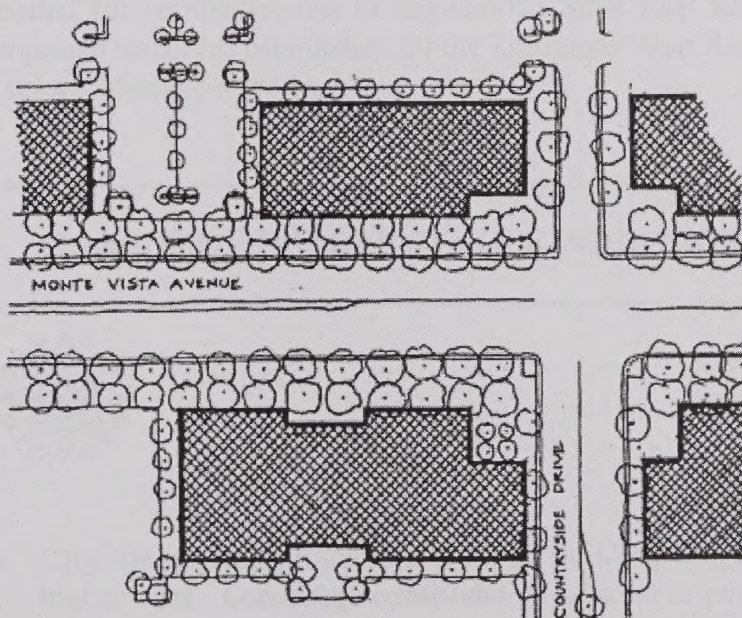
Illustrative Development Plan, Monte Vista West Subarea
